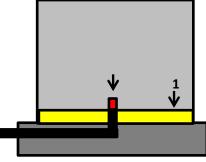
Additional 10 cm concrete floor (marked yellow) will be cast (1) inside the cistern once the cistern body is in place (see Picture 18).
